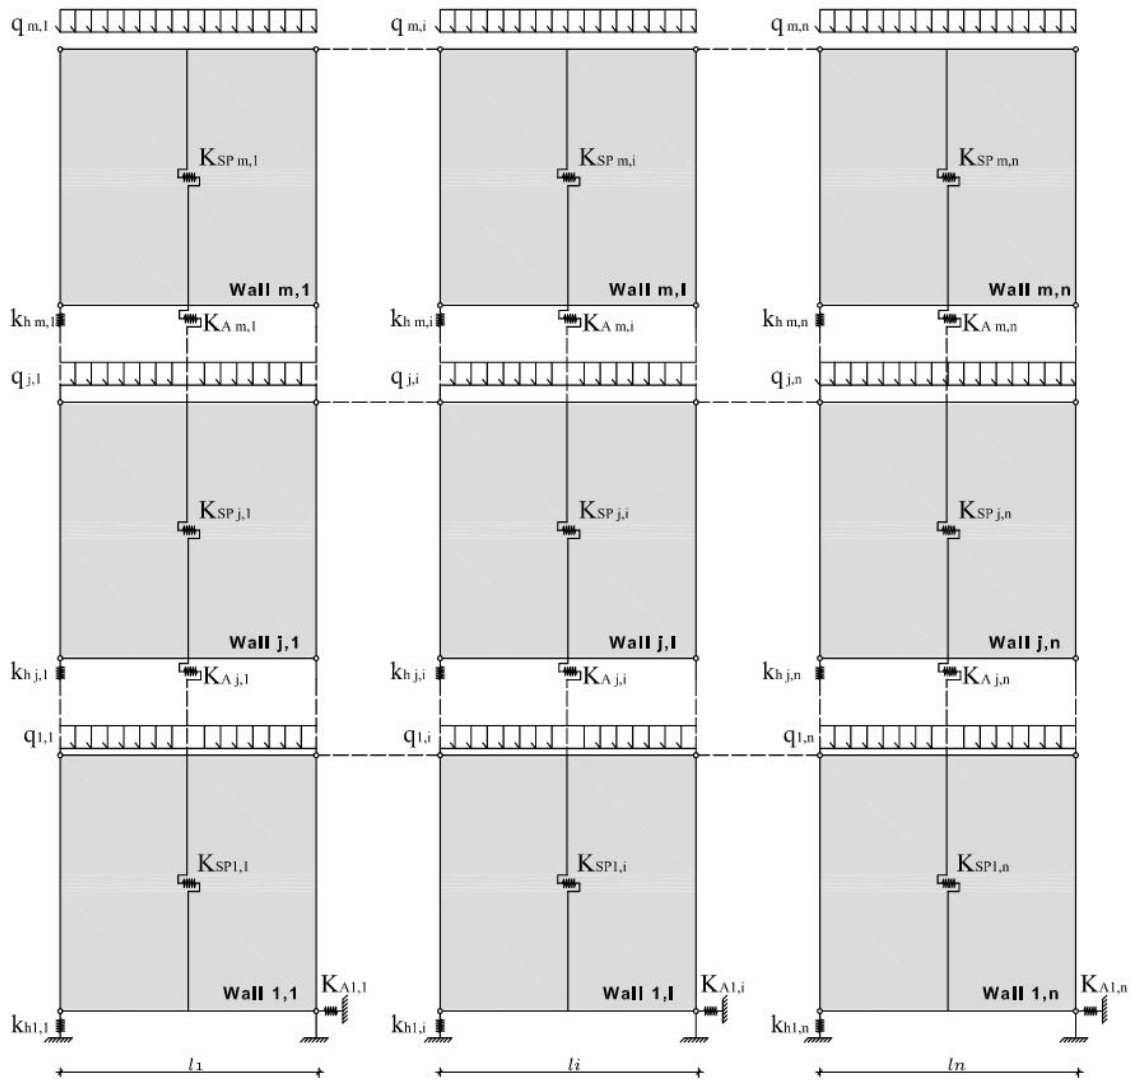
System of $m \times n$ shear walls modelling a full-scale building, Casagrande et al. (2015).
